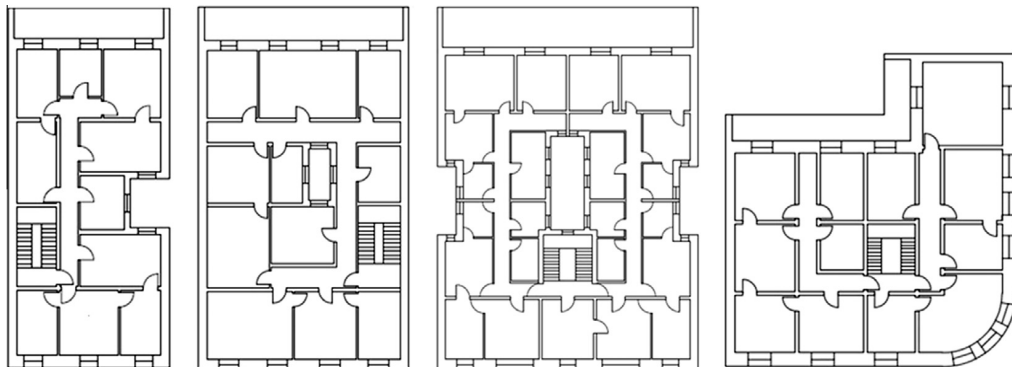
Typical plan geometry of “Gaioleiro” buildings type I, II, III and IV.
